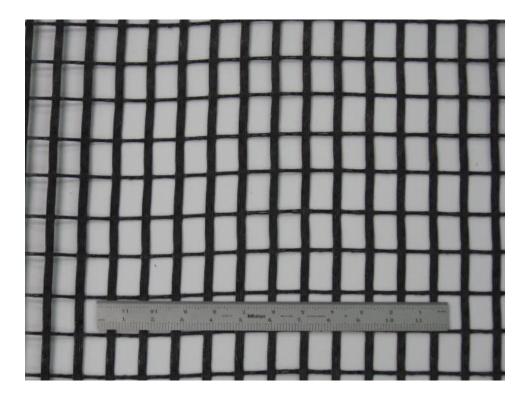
Photo of Miragrid 10XT (machine direction is perpendicular to ruler shown).
